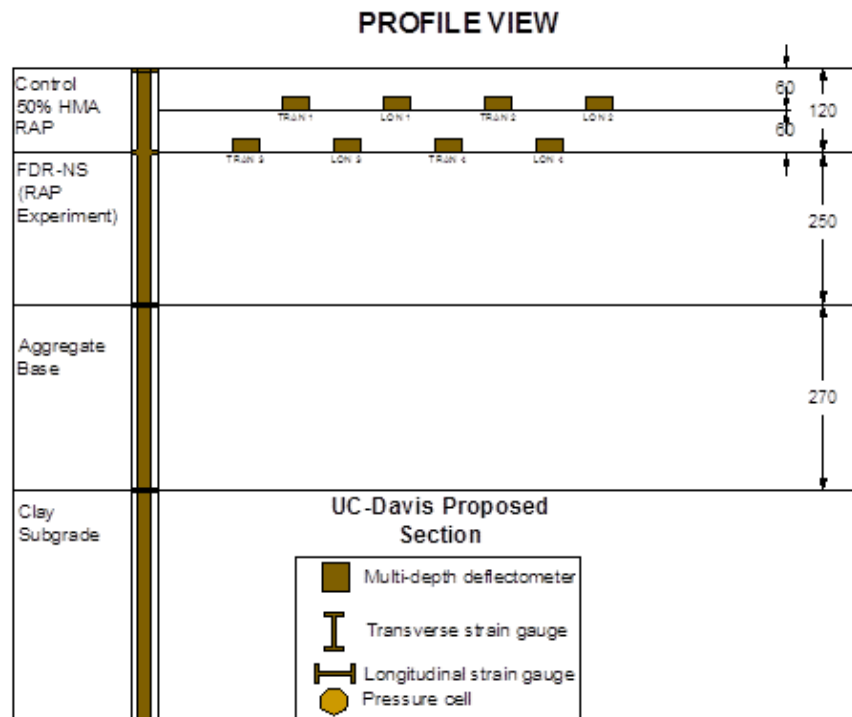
Illustration. Profile view of pavement structure and instrumentation for the 50%-RAP-AC test section at UC-Davis.
